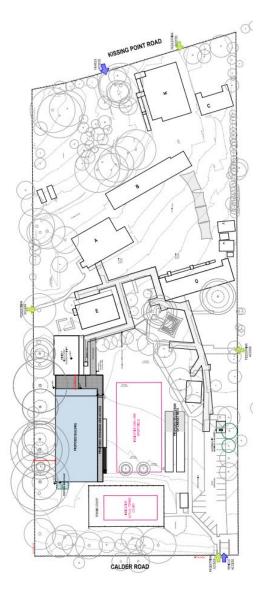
PROPOSED SCOPE OF WORKS (SOURCE: FULTON TROTTER ARCHITECTS, PROPOSED SITE PLAN (REV P5))
